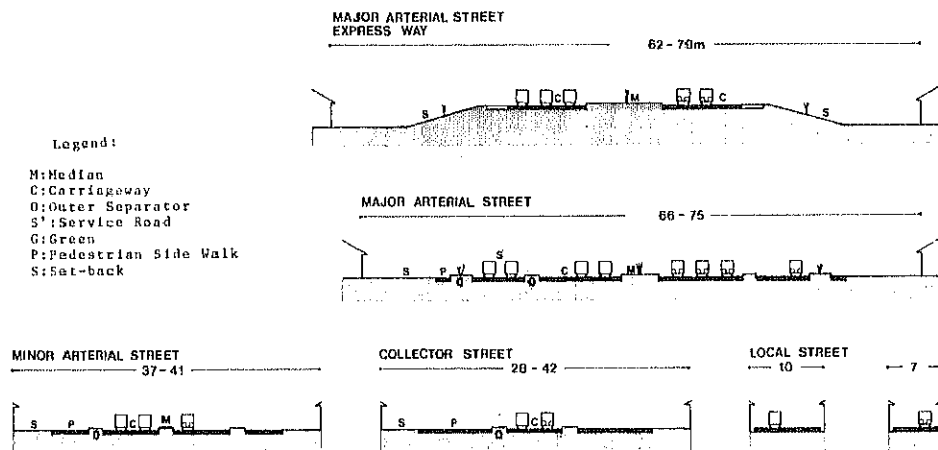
TYPICAL CROSS SECTION OF SECONDARY SYSTEM
